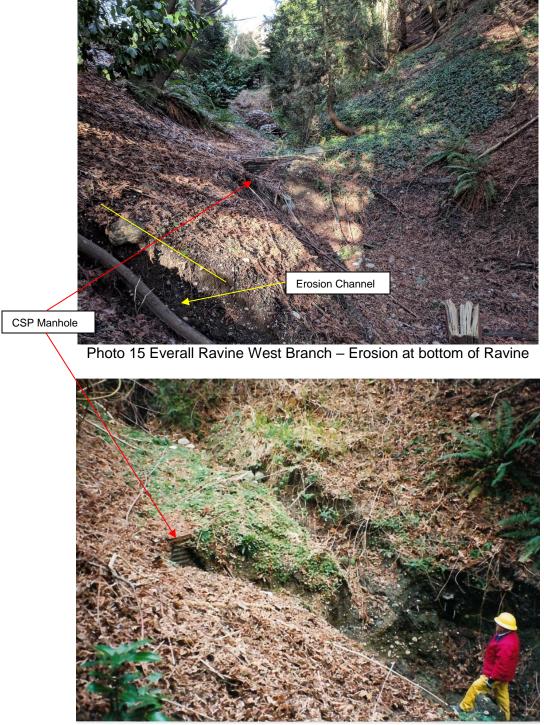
Everall Ravine – Creek Channel Damage in 2002
